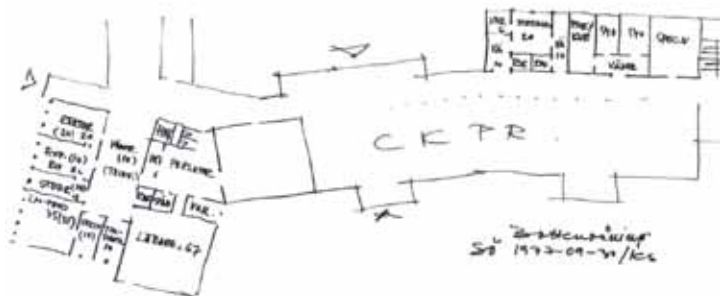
Risbro School, floor 1: Teachers' proposals before rebuilding and renovation.
